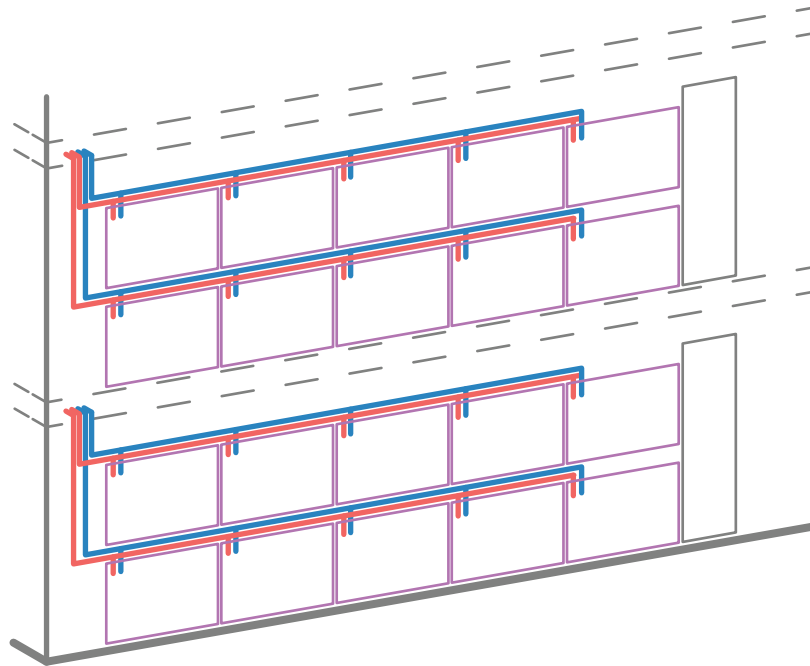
Proposed piping system for horizontally arranged facade-integrated PVT collectors (own illustration).
